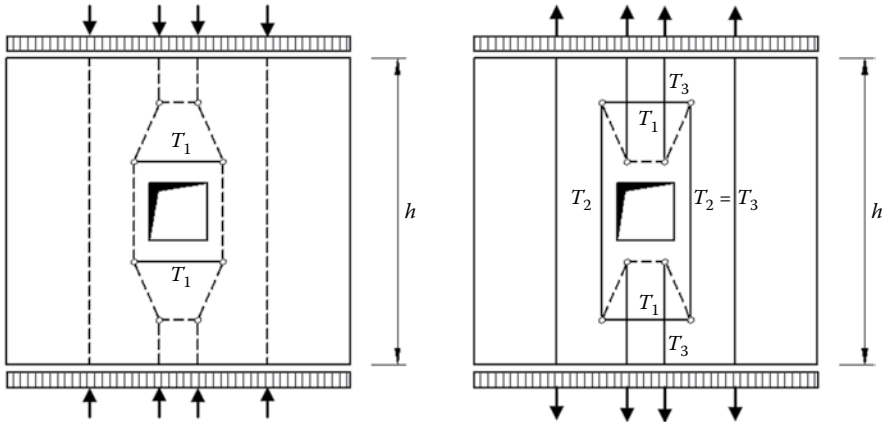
Walls with openings: (a) wall under uniform compression and (b) wall under uniform tension.
